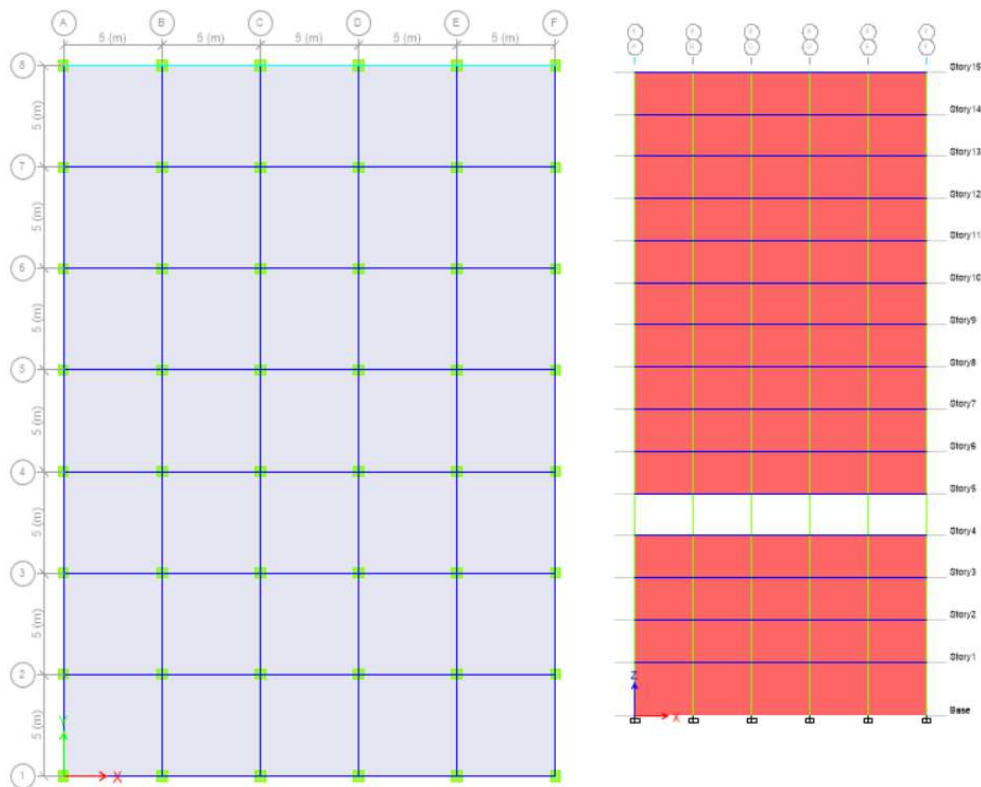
Plan and elevation view of the soft storey in 5th floor
